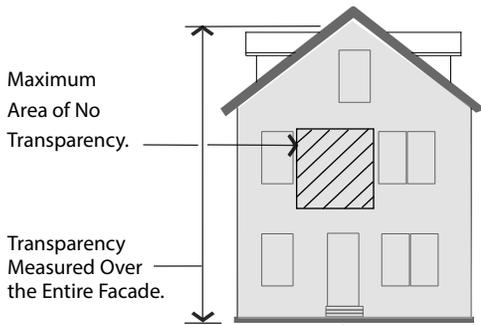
F-2. Measuring Transparency on Porch, Enclosed Porch & Stoop Buildings.
